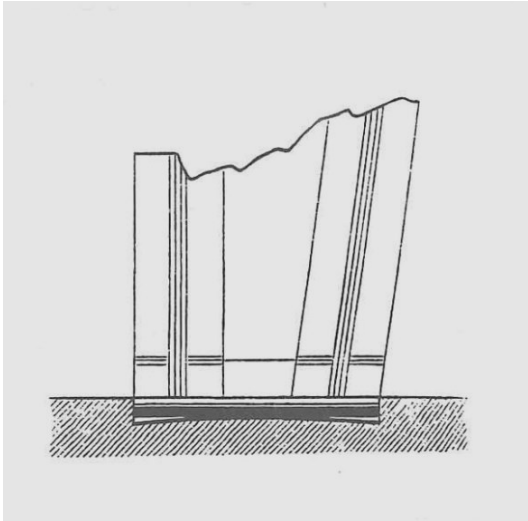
Detail of a steel column connection to a concrete foundation by means of a slightly curved metal sheet to reproduce the hinge effect. (Königer, Otto, *Die Konstruktionen in Eisen*, 1902)
